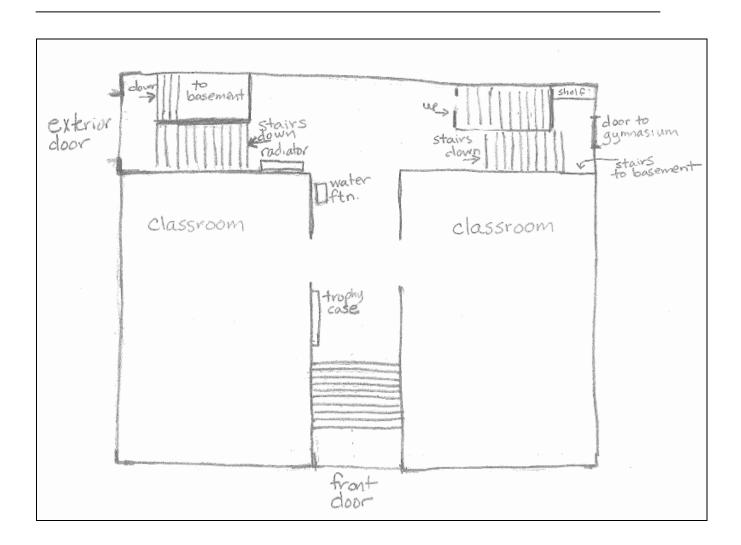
Rutledge School floor plan of main level, main school building. Sketch by Amber Johnson.
